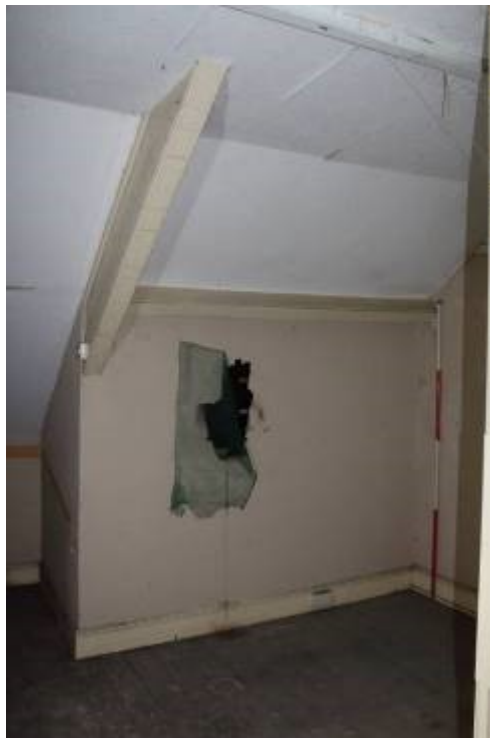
Northeast facing shot of the 3rd floor northeast frontage room. 2 scale.
